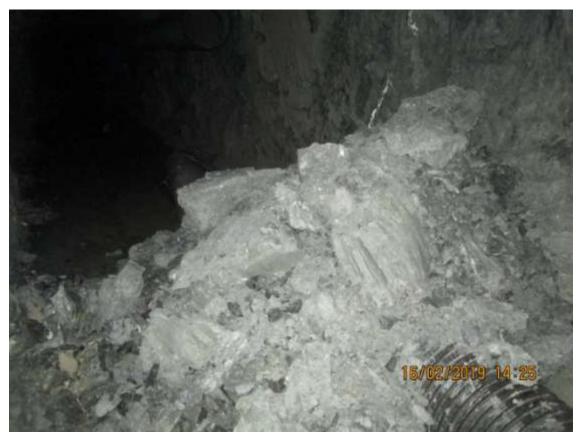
Caving, confined to moistened crushing zones in the right wall of mine workings
